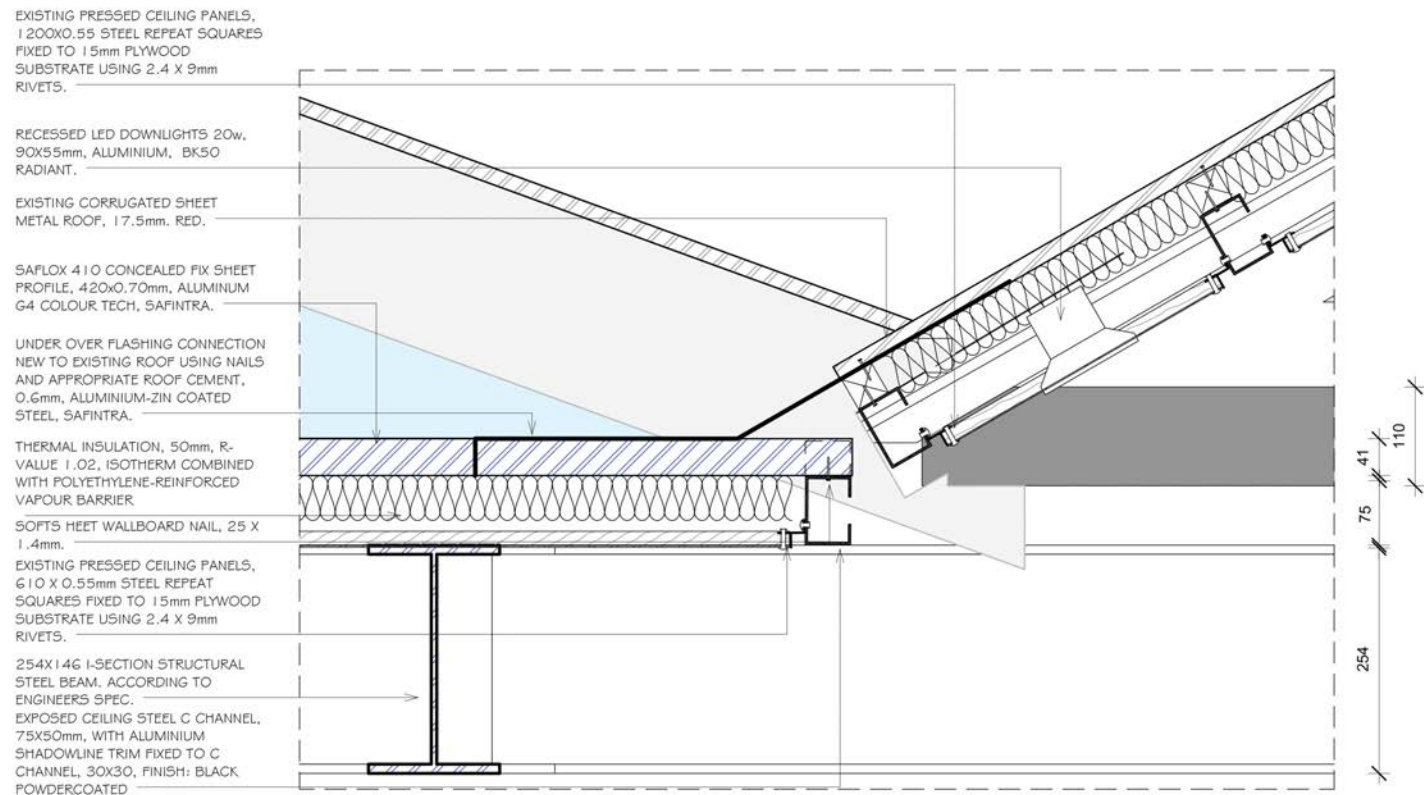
Detail 2 existing and new roof, not to scale (Author 2018)
